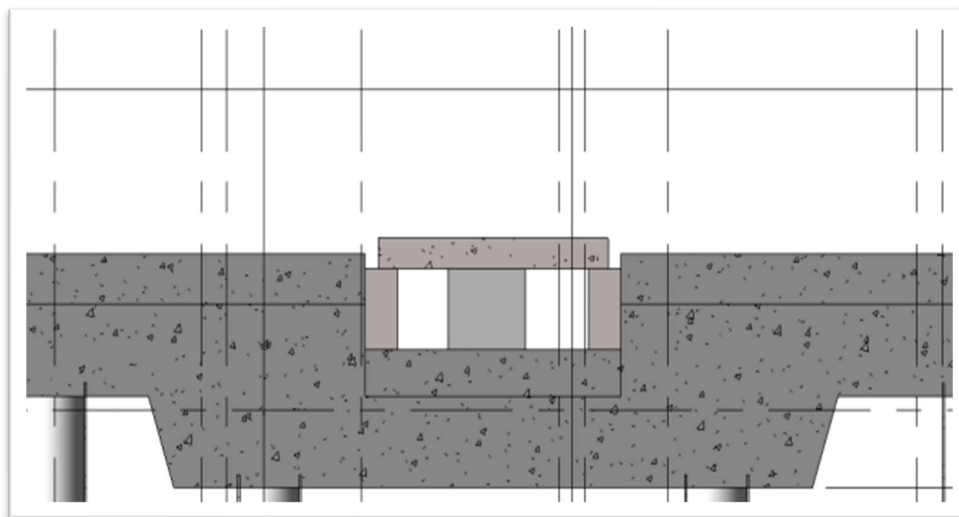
shows a precast slab sitting on the two walls that have a higher elevation than the two slabs on either side
